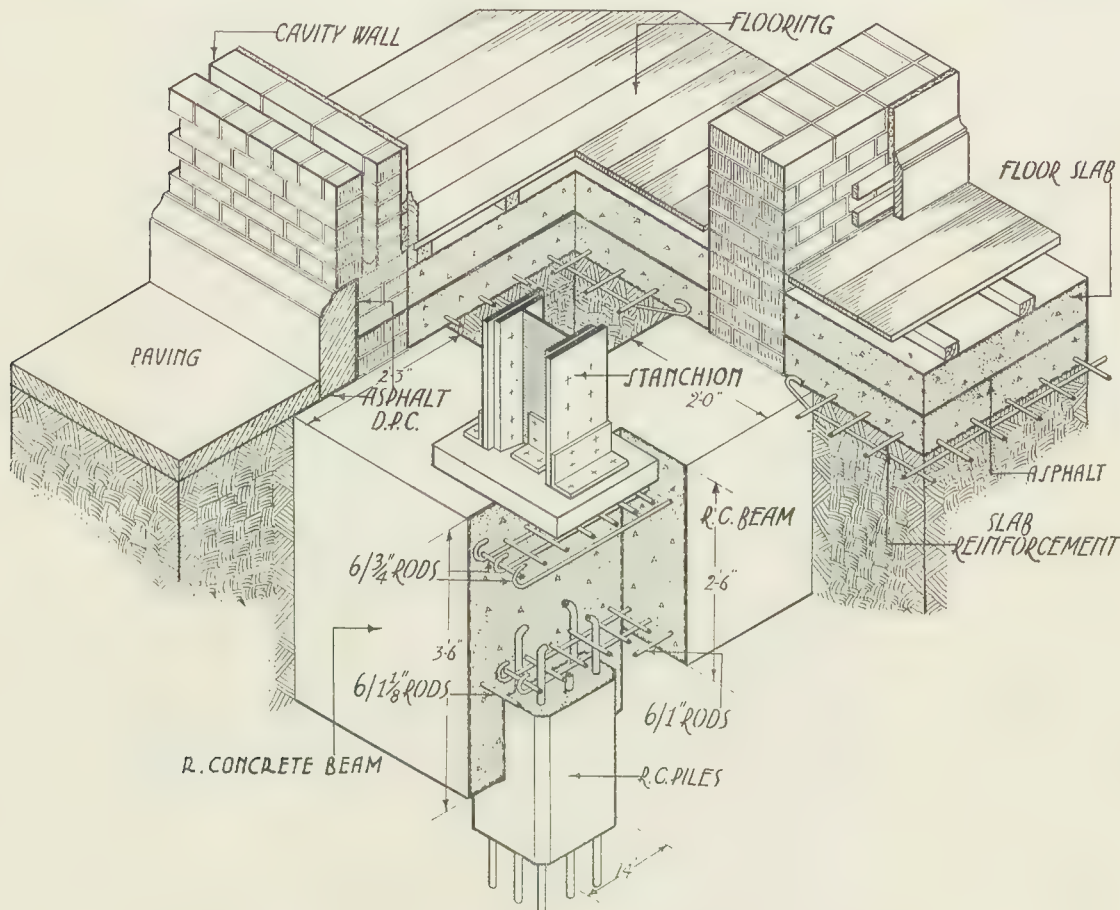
REINFORCED CONCRETE PILE AND BEAM FOUNDATIONS
